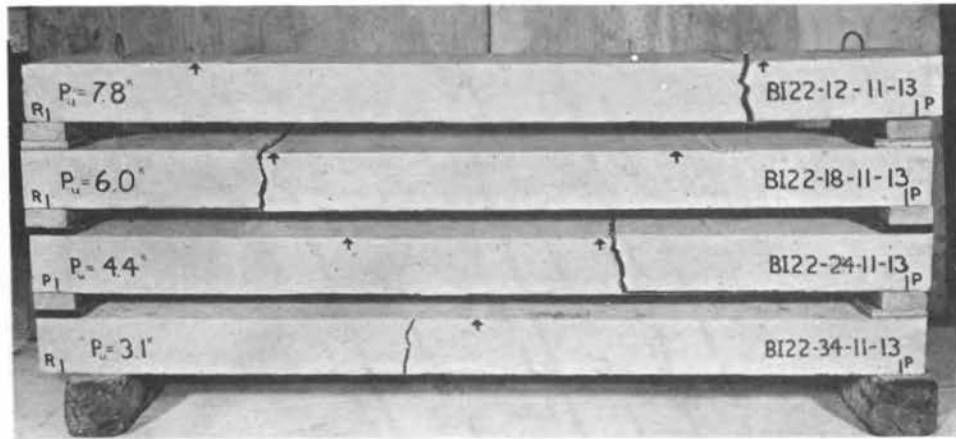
Failed beam specimens for casting numbers 11 and 12 using 22-gage steel form I.
